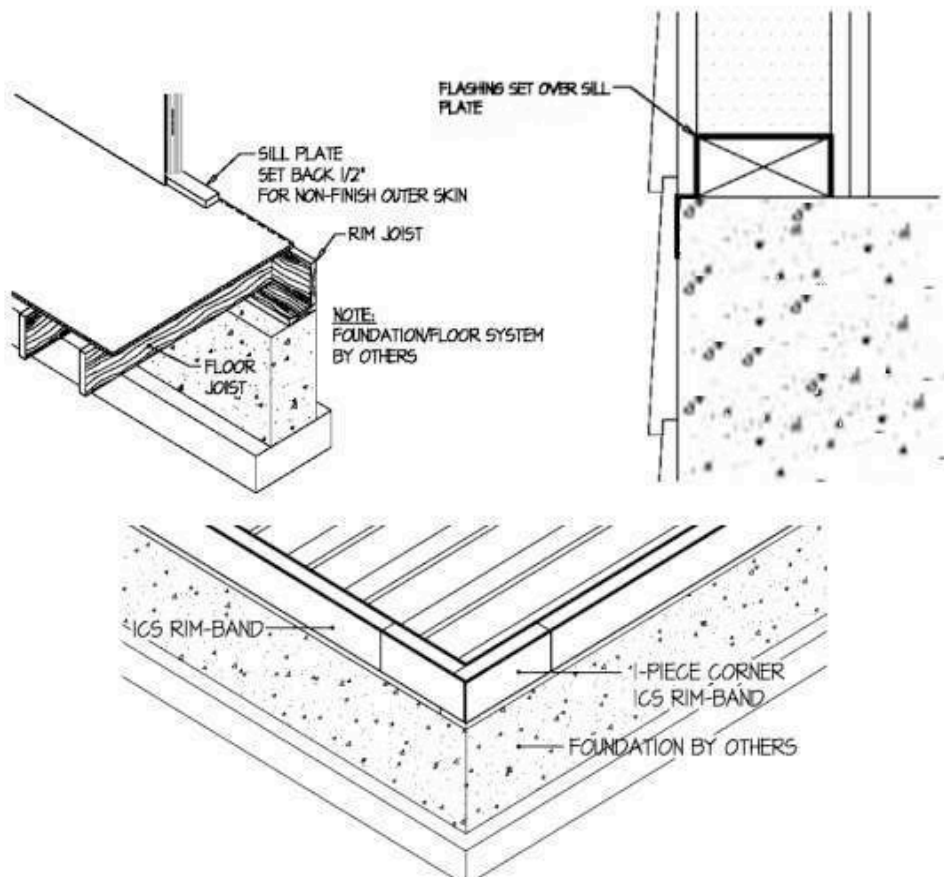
Sill Detail. The outer edge of the wall panels should be flush with the outside of the concrete frost wall so that full support is provided. Secure the sill plate with foundation tie straps. Interior foundation insulation is generally recommended. If using exterior insulation, bevel the top edge as shown and cover joint with a beveled skirt board. Figure 4c shows how corners overlap.
